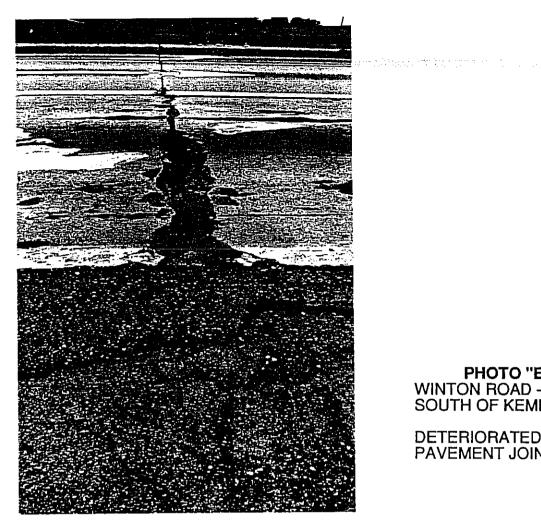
PHOTO "E" WINTON ROAD -SOUTH OF KEMPER ROAD
